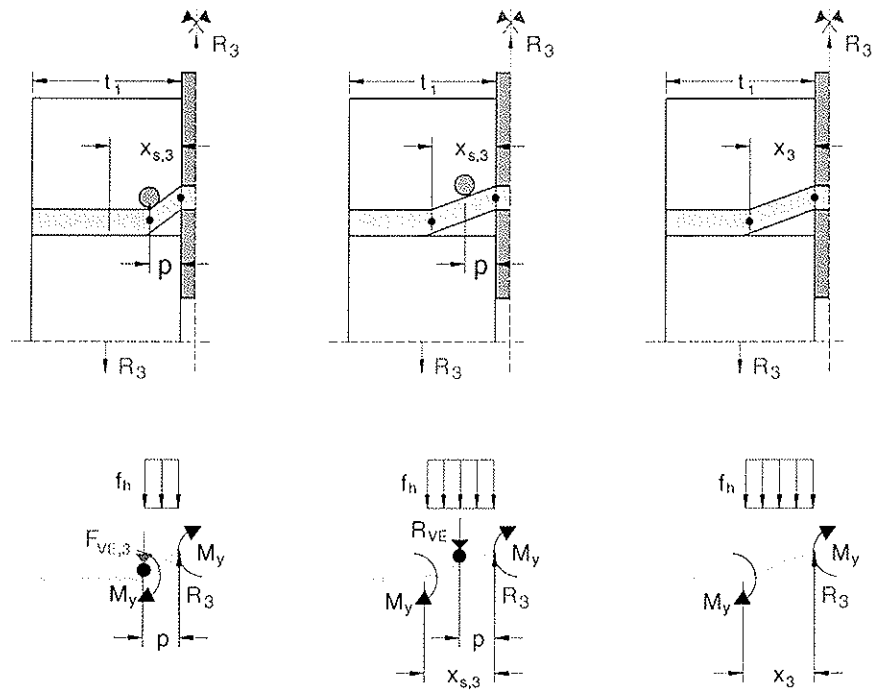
Reinforced connection with sub-failure mode “rigid”, reinforced connection with sub-failure mode “soft” and non-reinforced connection (from left to right side)
